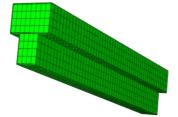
Finite element model of T-shaped concrete-filled steel tubular columns
